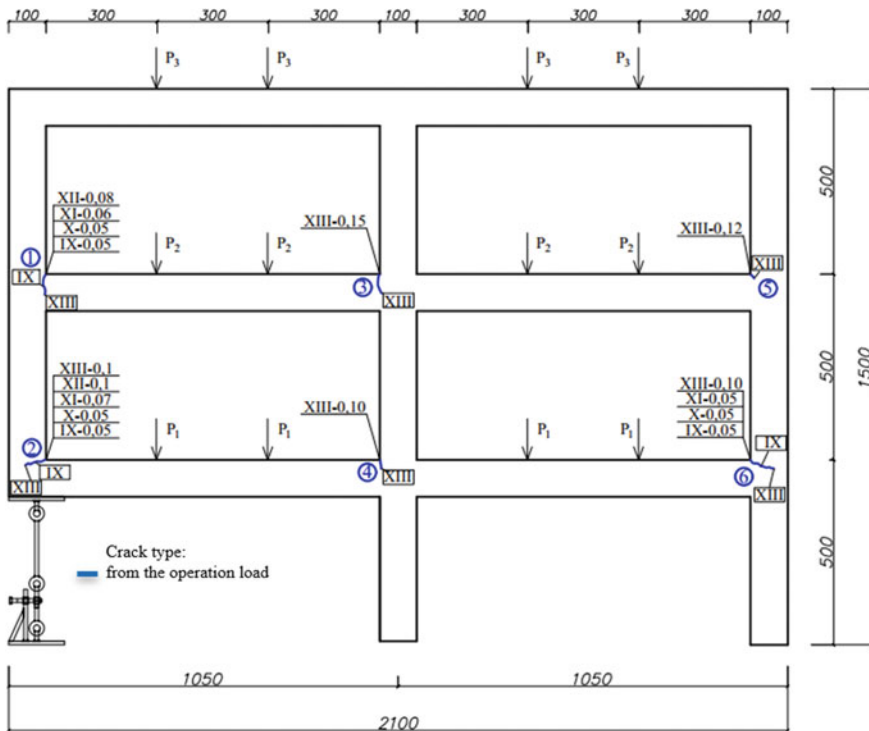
Design of formation and opening width of cracks of all types in the structure of the FR-2 frame before the application of a special load
